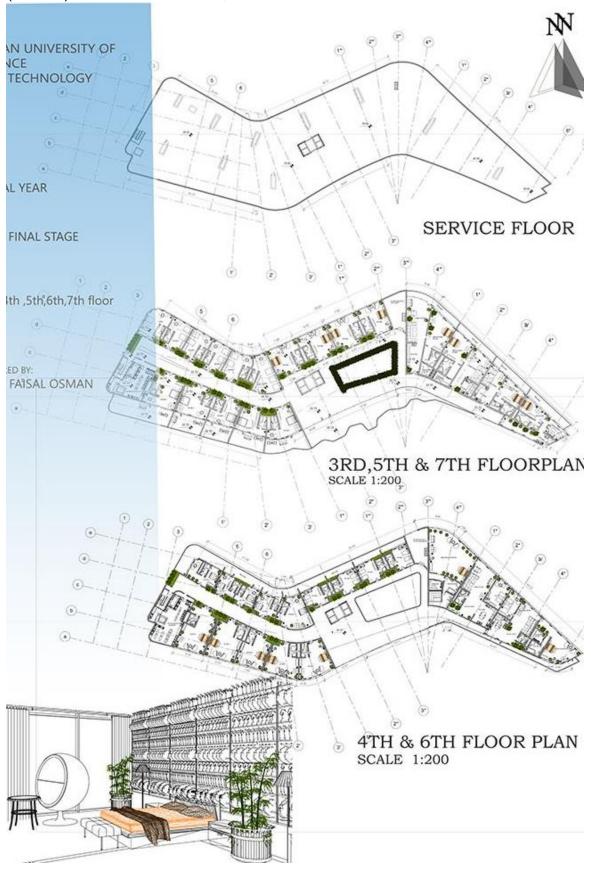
SHOWS SERVICES FLOOR ,3<sup>RD</sup> .TO 7<sup>TH</sup> FLOOR
